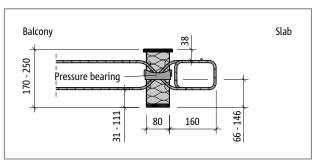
Schöck Isokorb® T type Q-E-W-VV4: Product section
